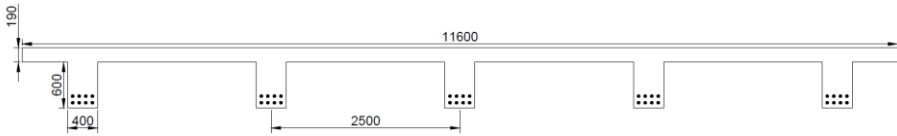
Cross-section of the RC girder bridge (dimensions in mm)
